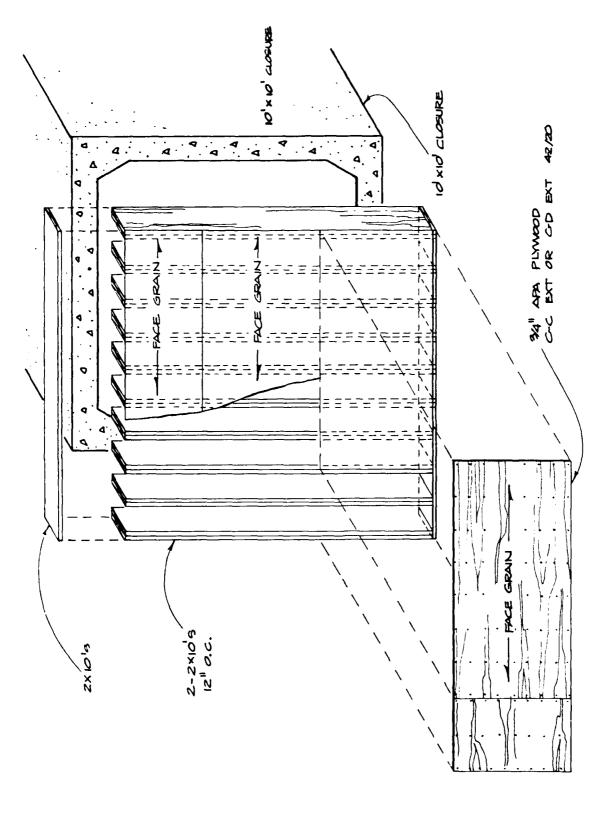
Typical Closure for a 10 ft by 10 ft Box Culvert For 2 psi.
